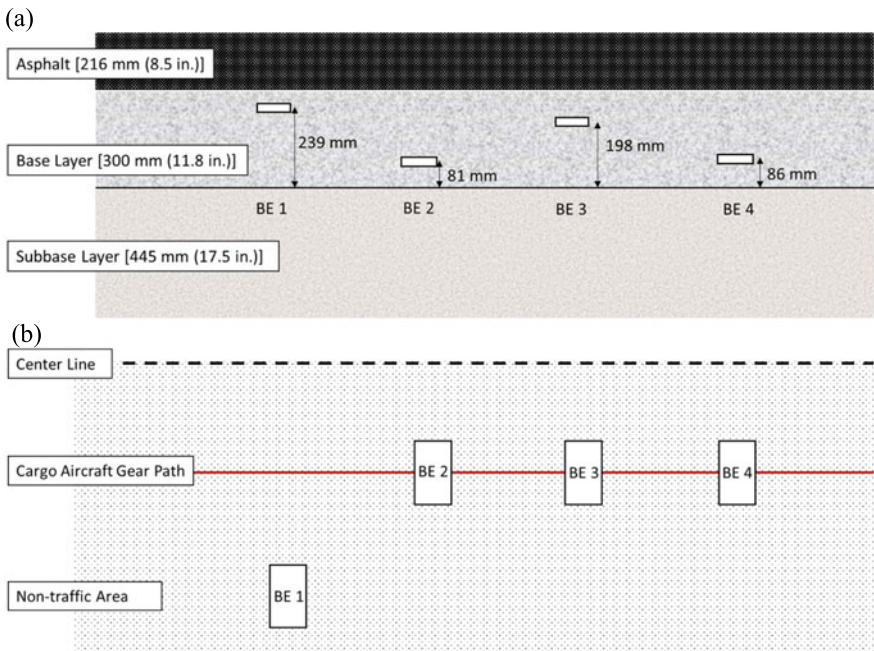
Constructed Smart Runway pavement test section showing the locations of the BE field sensors: a cross-sectional view; and b plan view
